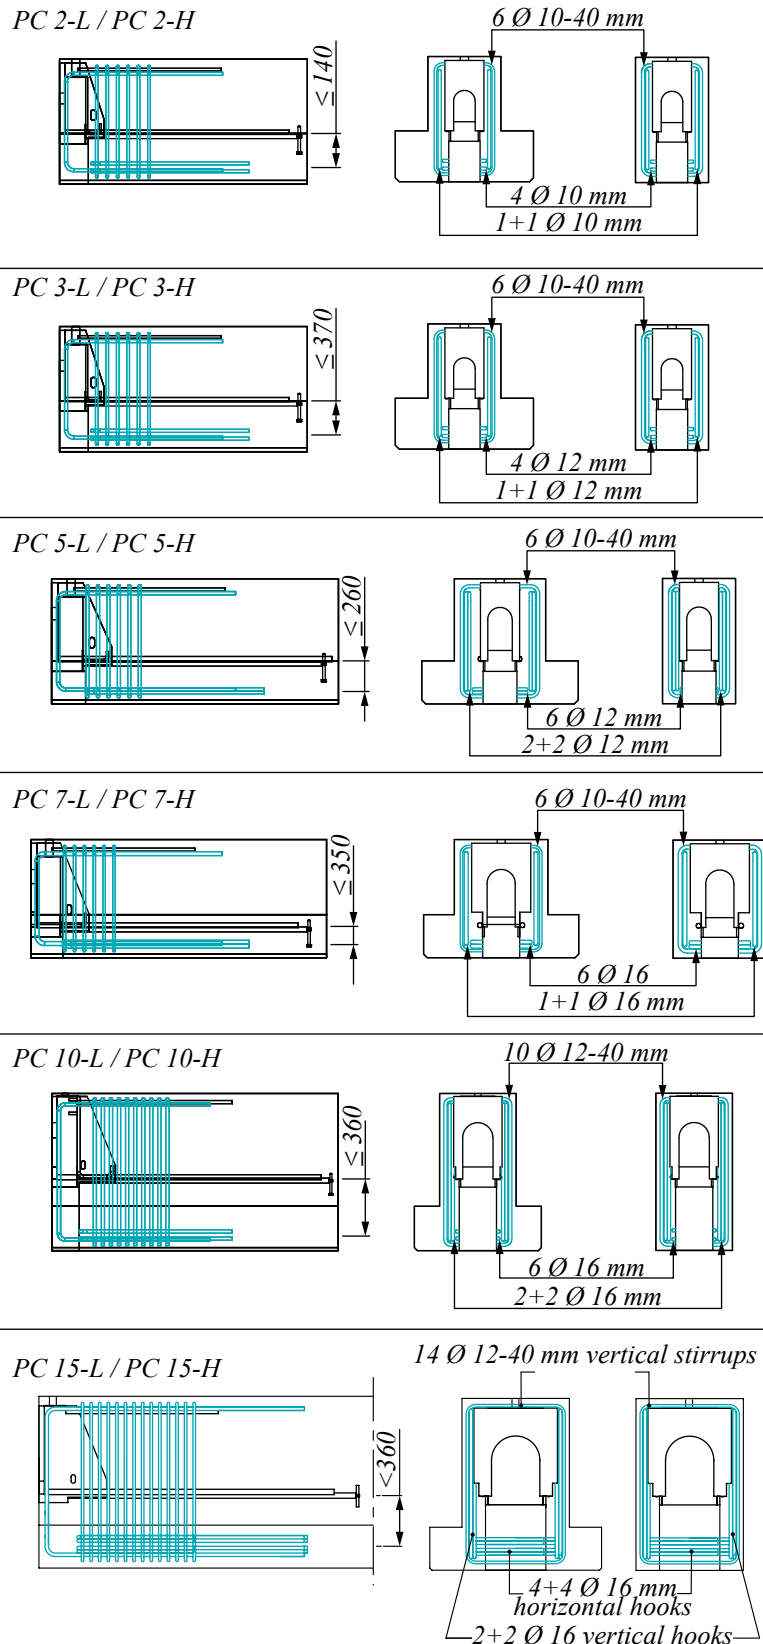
Supplementary reinforcement of the beam when the distance between the anchors of the shoe and the main reinforcement is more than 100 mm.
